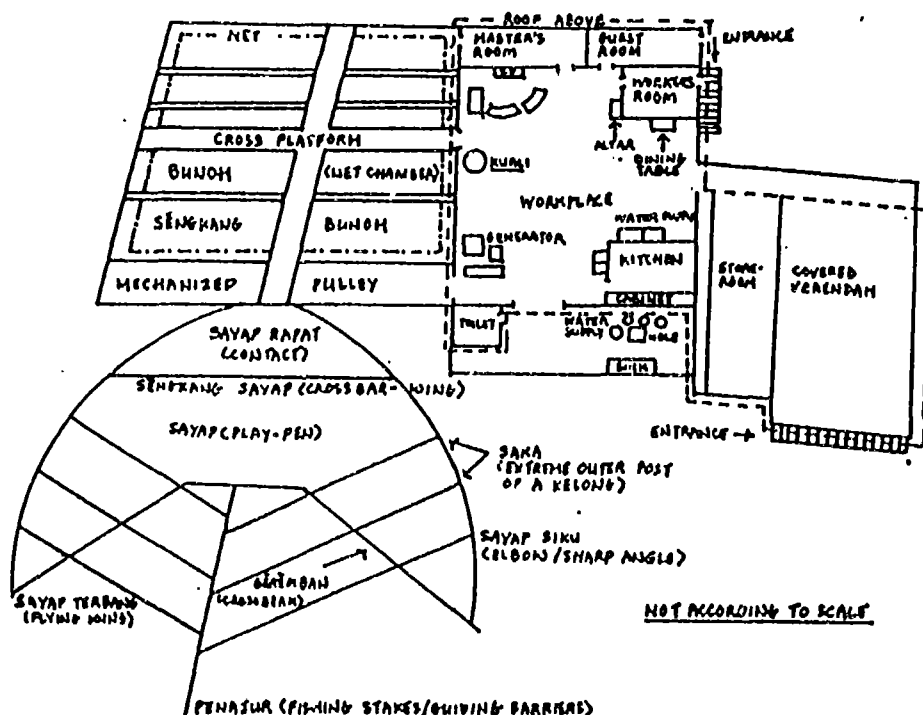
CROSS-SECTION OF AN OFF-SHORE PALISADE TRAP
